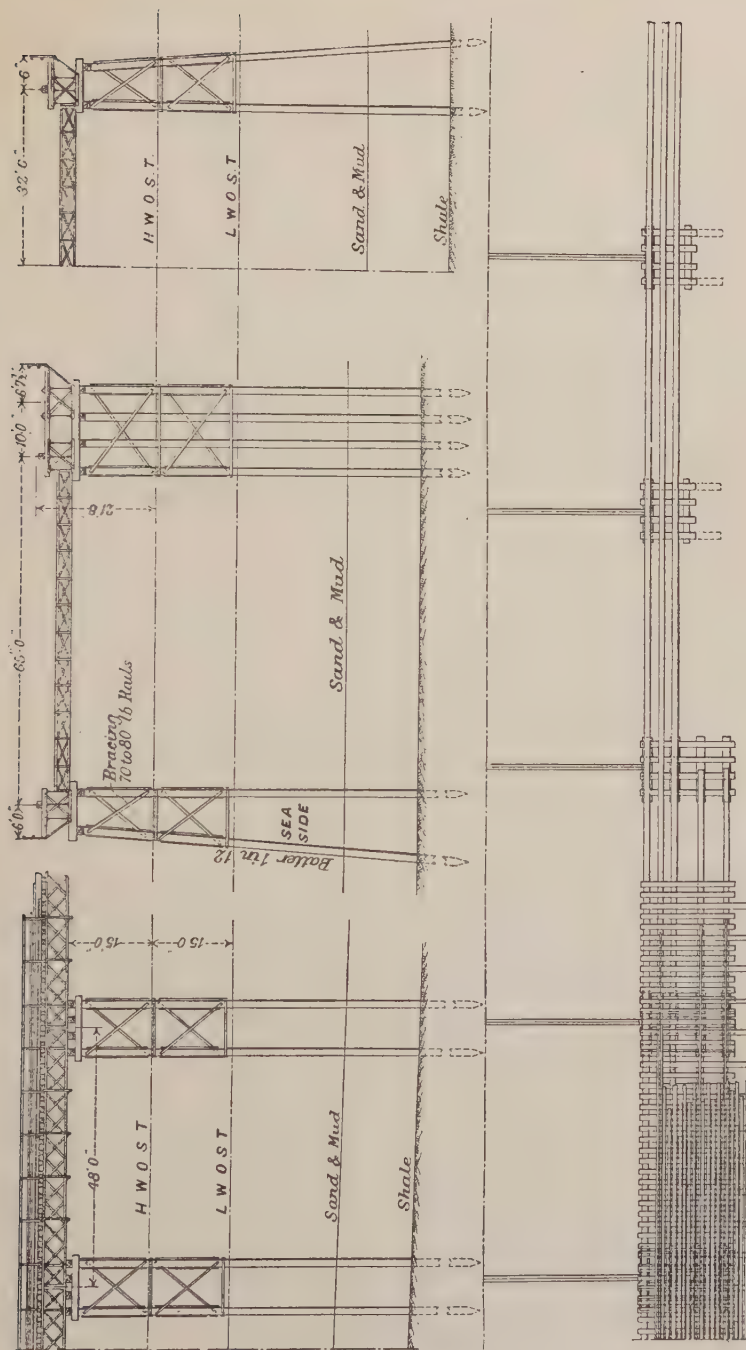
Temporary Staging at Tyne North Pier Reconstruction.
